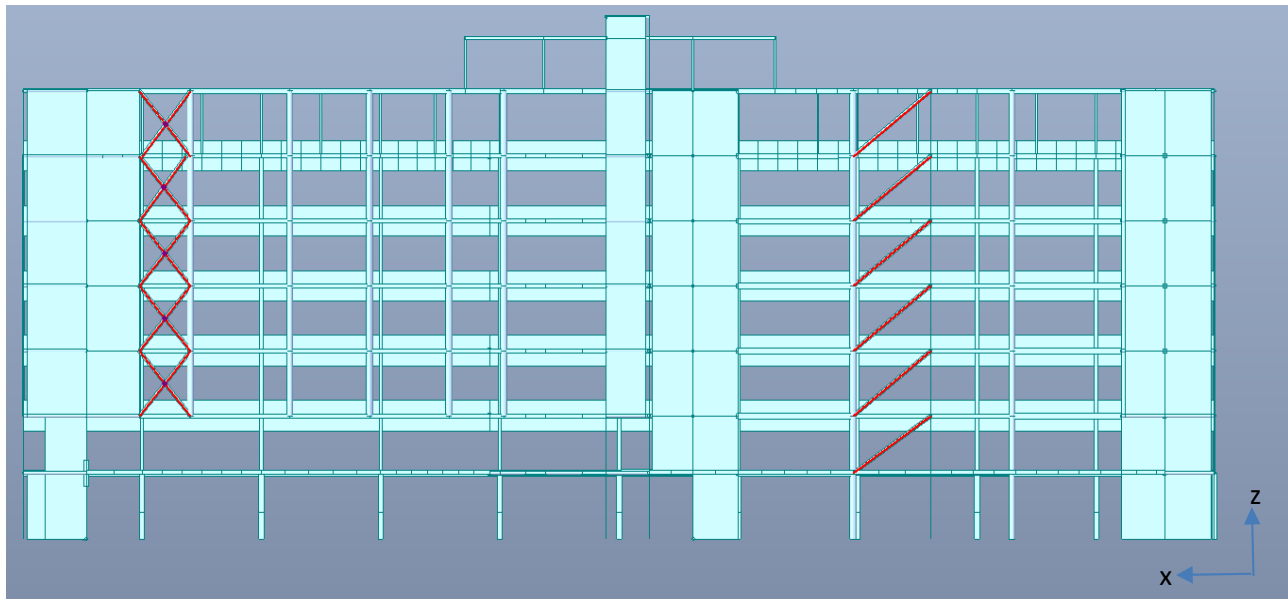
Side view of the retrofitted structure highlighted in red the steel bracings.
